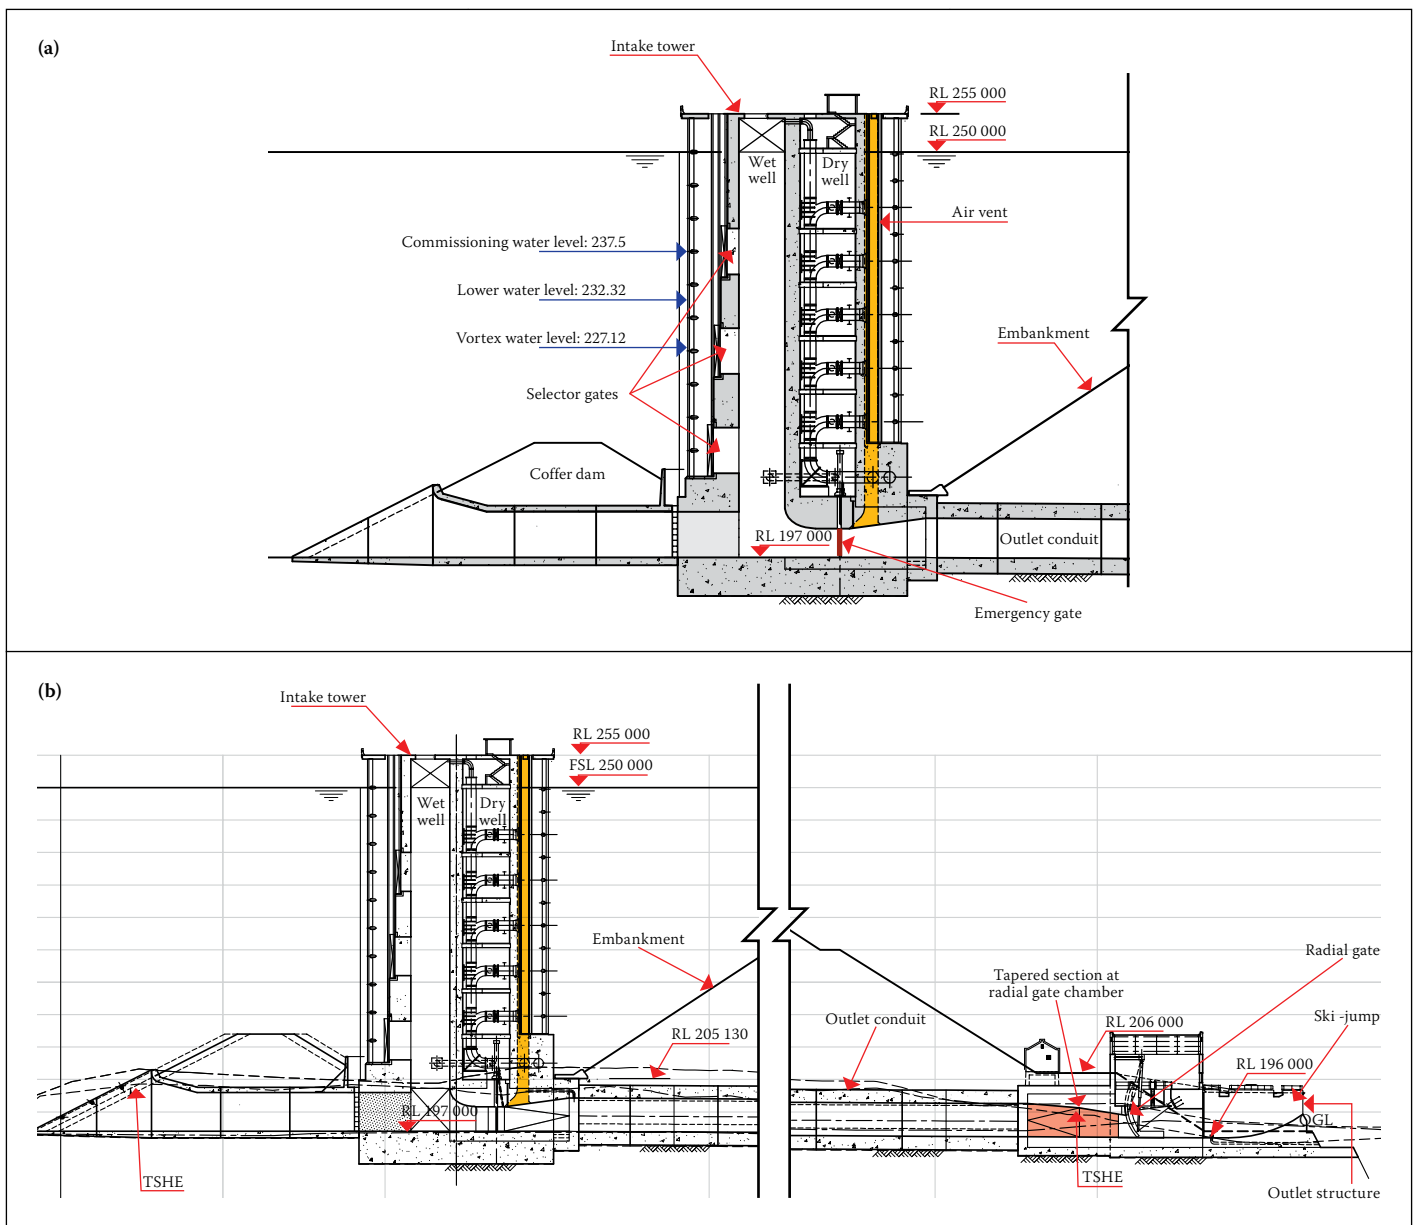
(a) Cross-section of Berg River Dam intake tower and (b) complete outlet structure (adapted from TCTA 2003)
